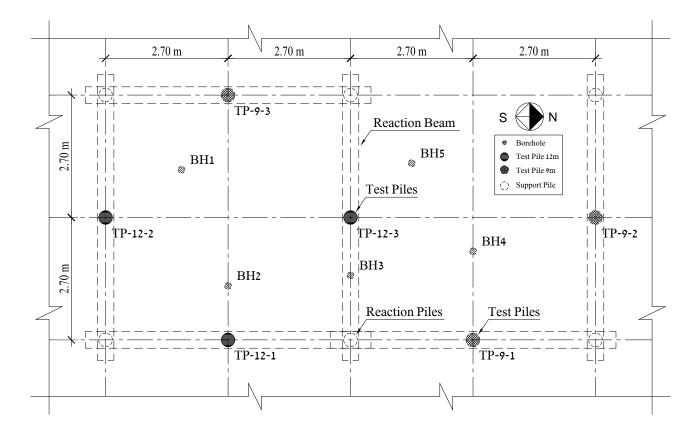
Layout showing the test pile and bore hole locations on the site map
